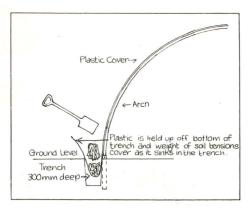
The plastic sheeting is stretched over the tunnelhouse frame by the weight of soil on the sheeting, which is placed into a 300mm deep trench at the perimeter of the tunnelhouse.
